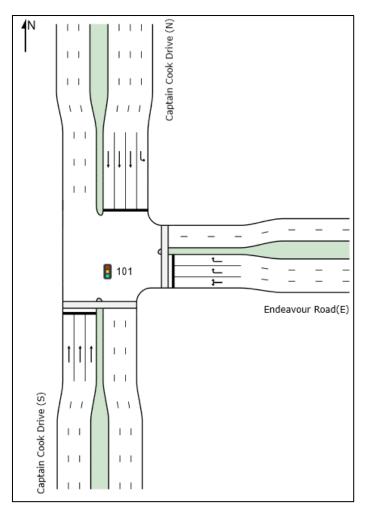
NEW ENDEAVOUR ROAD / CAPTAIN COOK DRIVE ACCESS UPGRADE REQUIRED UNDER WAREHOUSE REDEVELOPMENT
